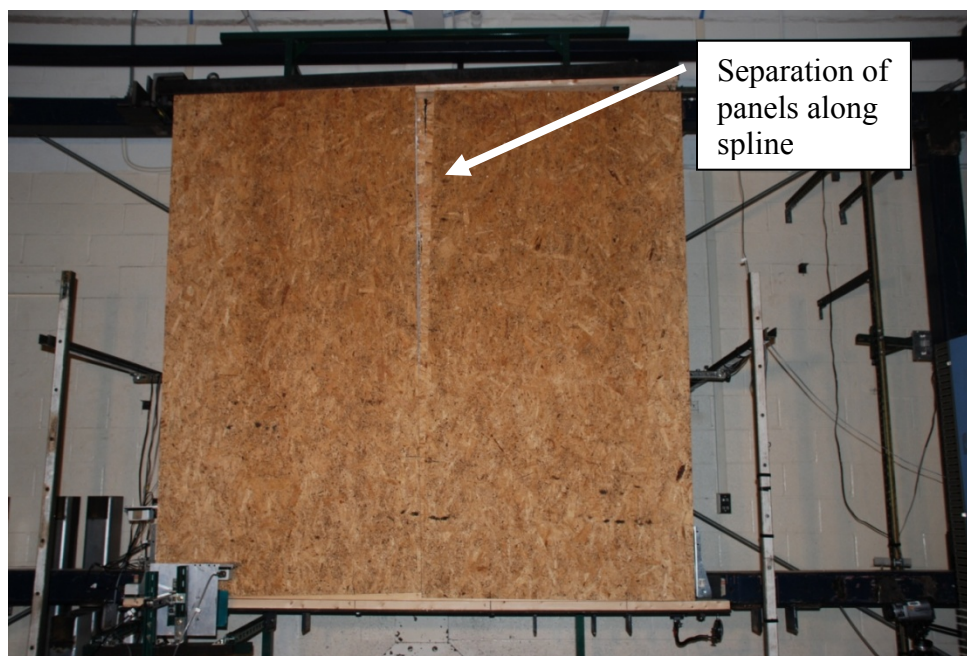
Specimen A3-1C after wall failed under cyclic loading
